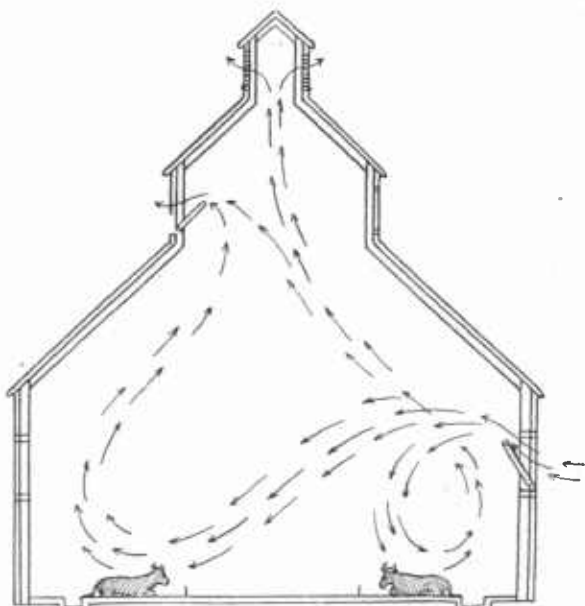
Cross section of monitor-roofed stable with hinged-valve system of inlets and outlets.
